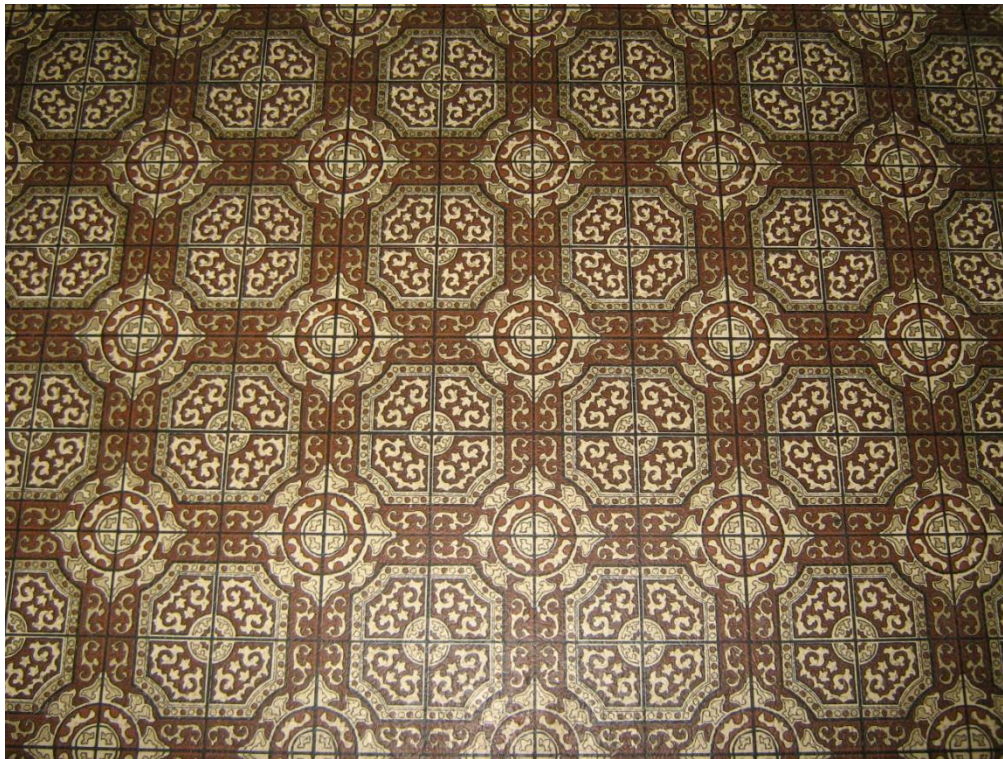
ACM Vinyl sheet floor, (Rm. 42). 1952 era Press Box.
